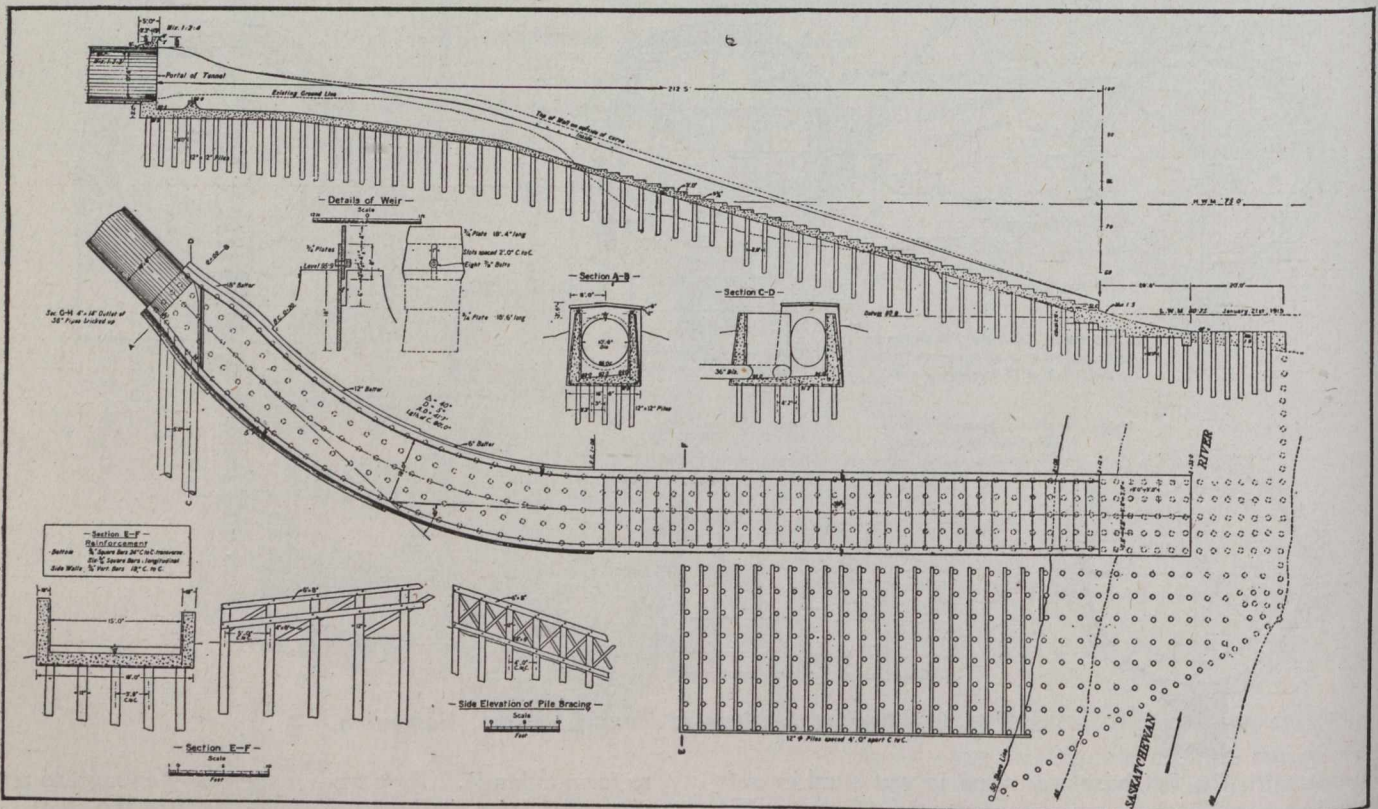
Plan, Profile and Details of Main Sewer Outlet, Edmonton.
